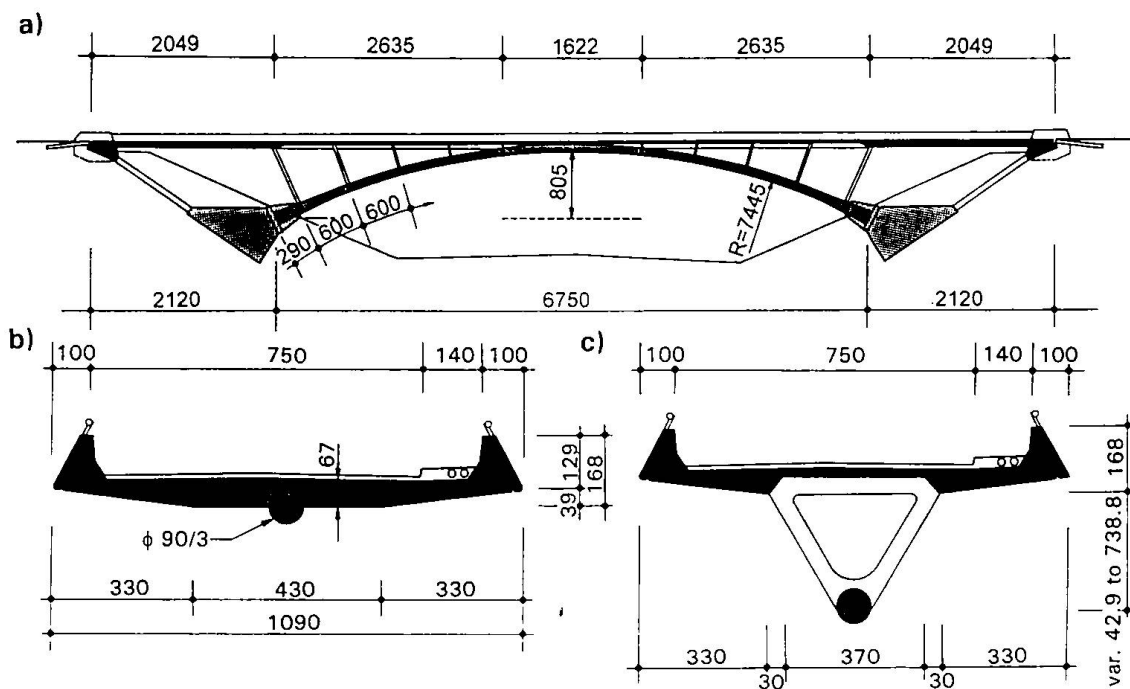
Structural solution: a) elevation, b) cross section at midspan, c) typical section
